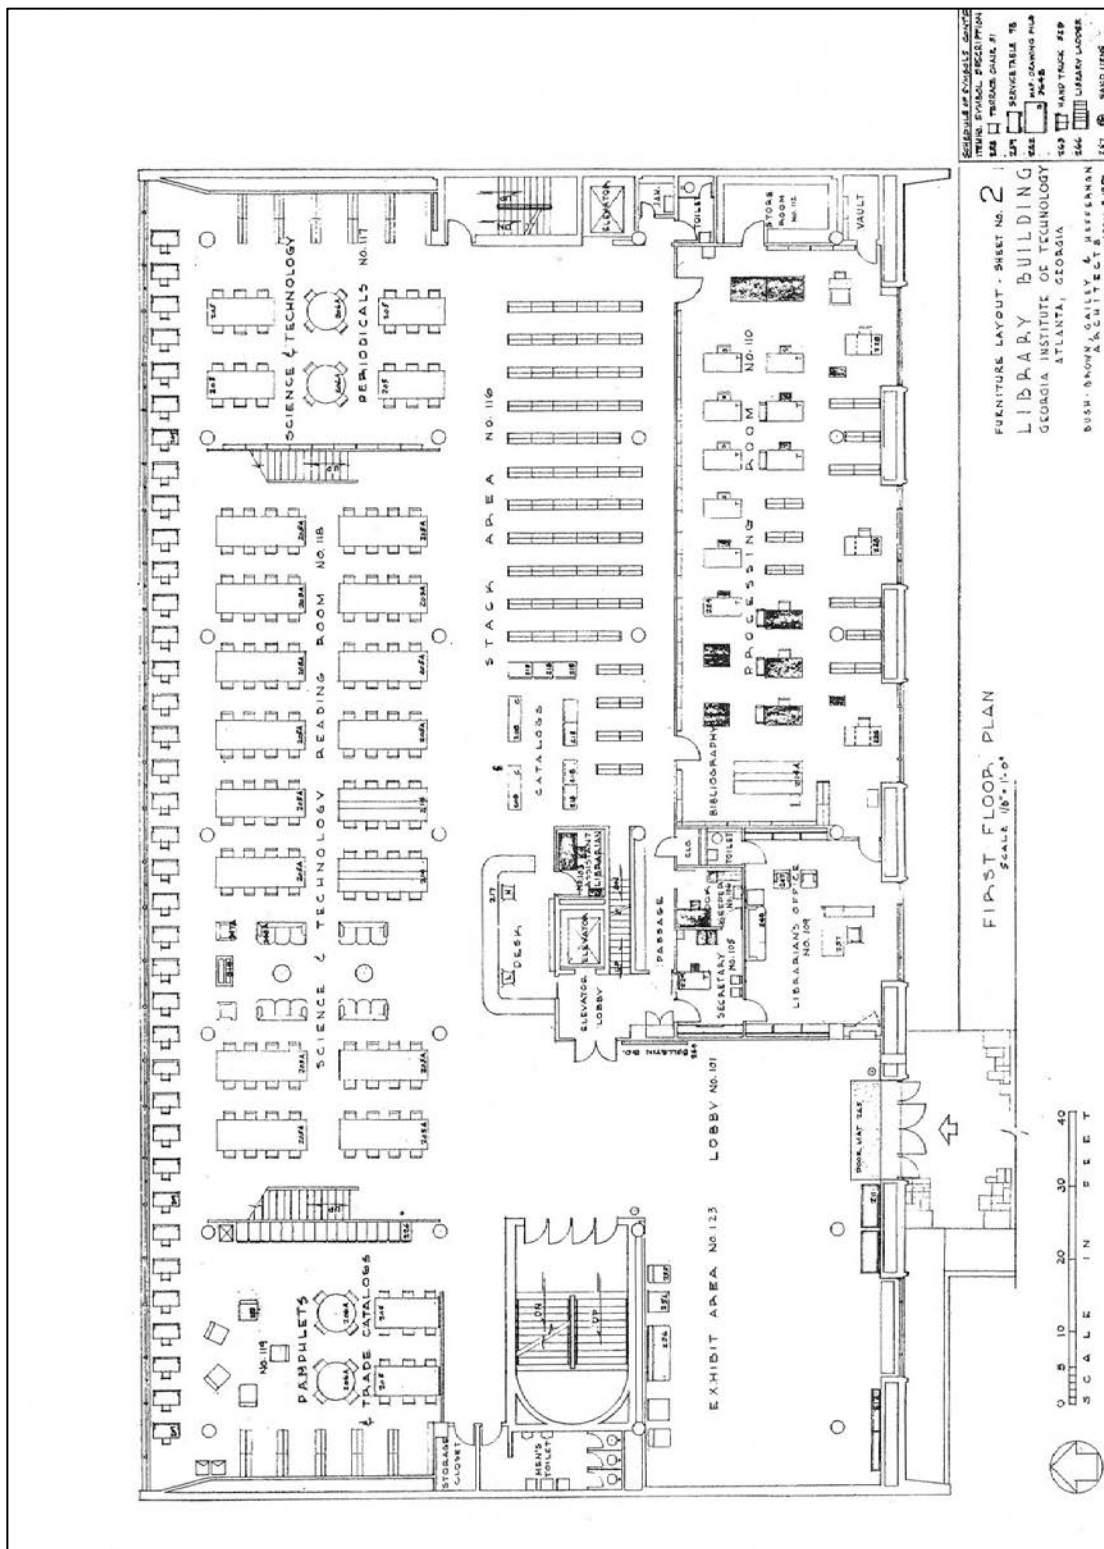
Original first floor plan and furniture layout; Dedication Brochure *Georgia Tech Archives*. UA415A, Series 3: Subject Files: Buildings and Grounds, ca. 1900-ca. 2011, Box VF35, Folder 24.
